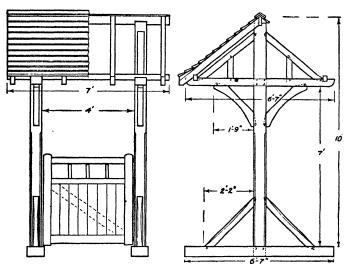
FRONT AND SIDE ELEVATIONS OF LYCH GATE.
